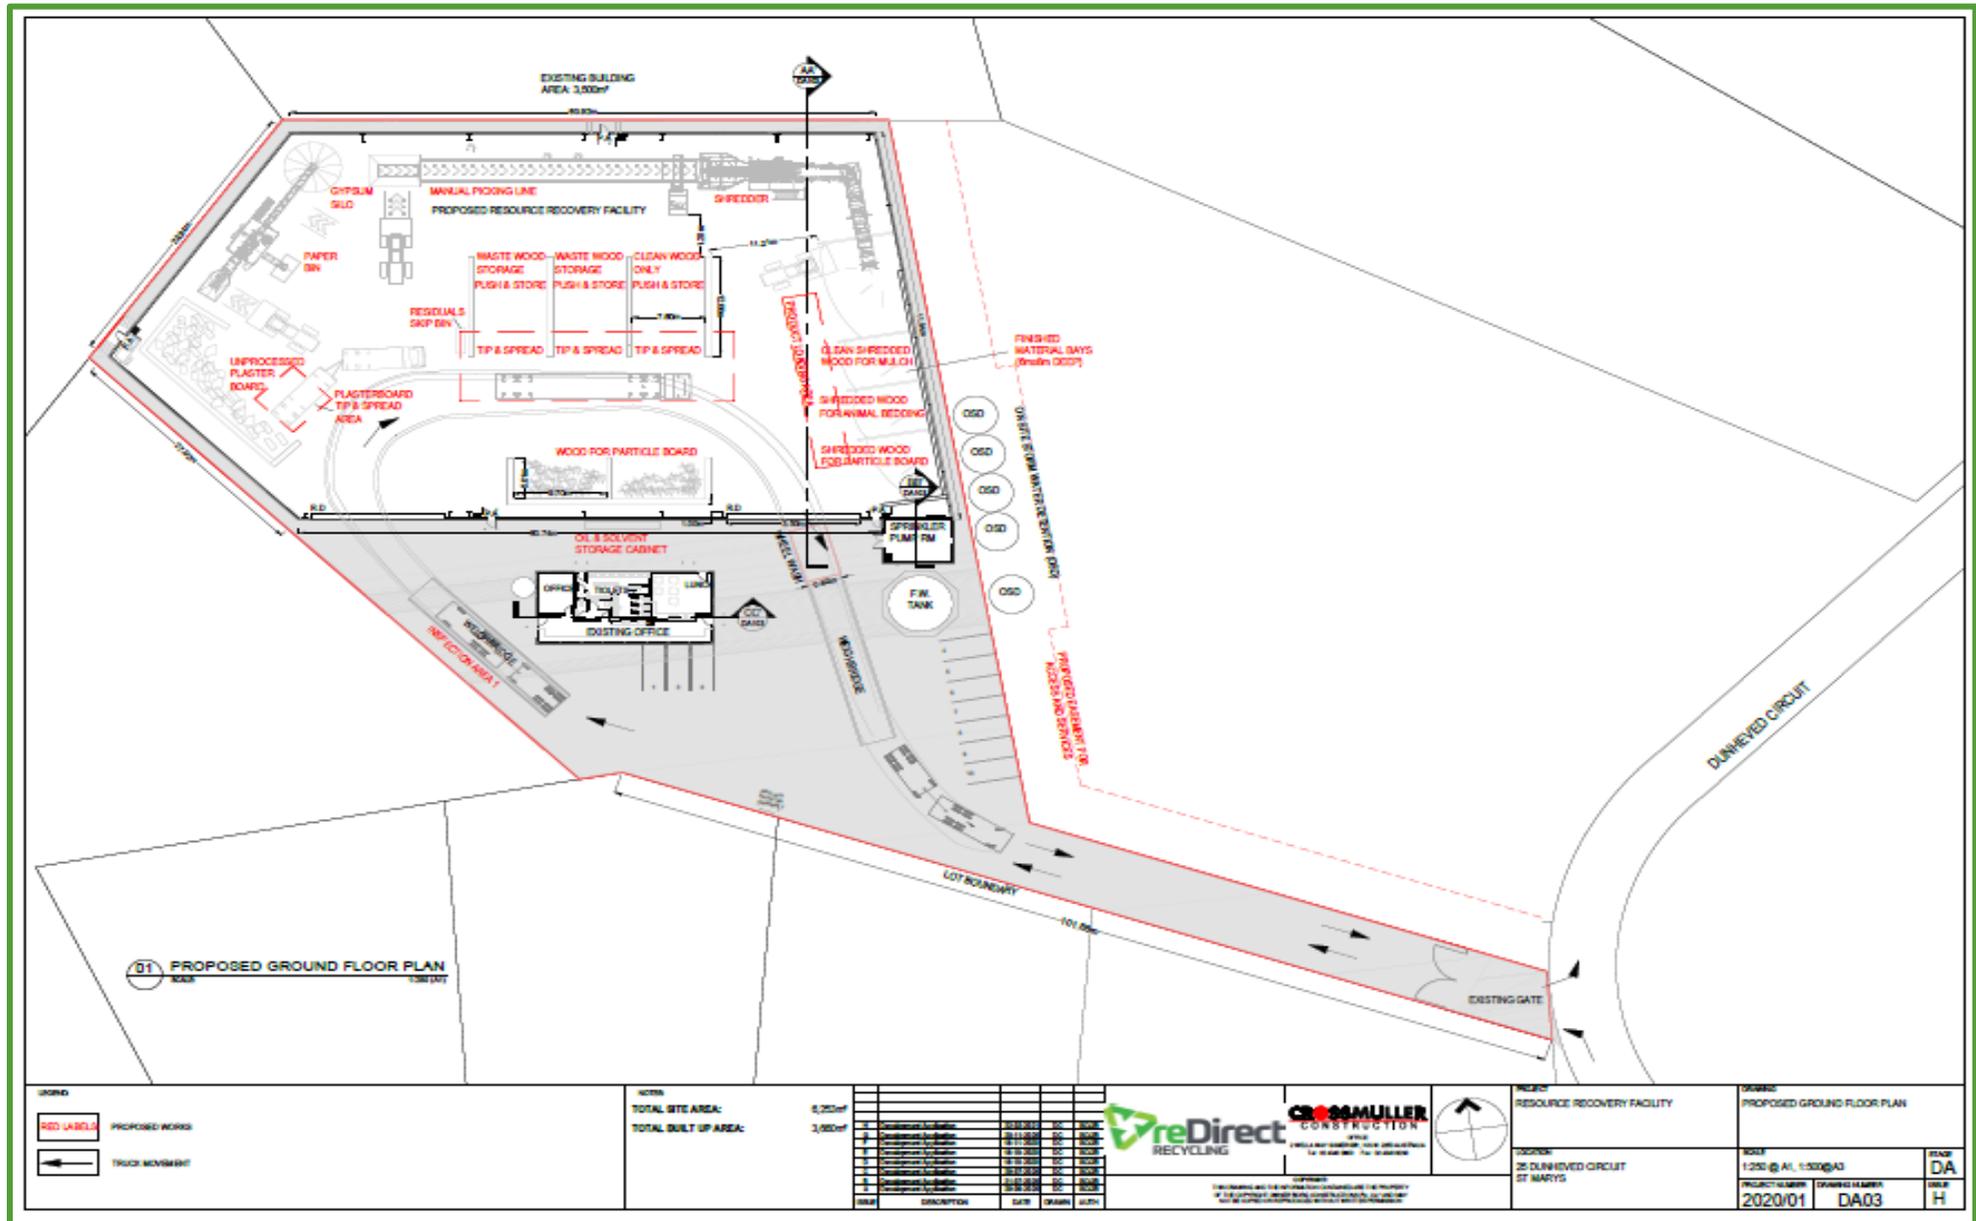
PROPOSED SITE LAYOUT 25 DUNHEVED CIRCUIT, ST MARYS
